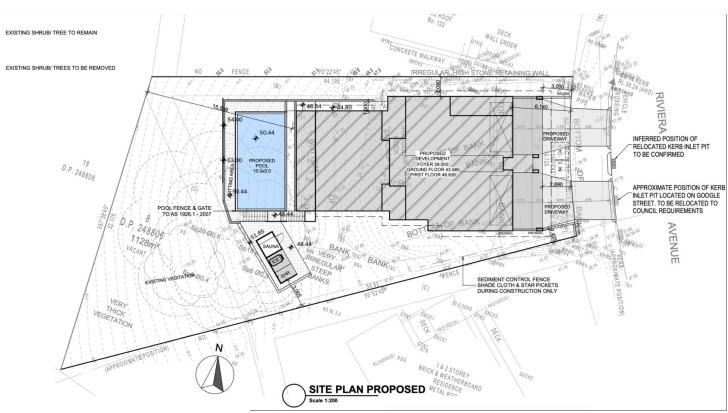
Proposed Development (Sorensen Design & Planning, 2022)
